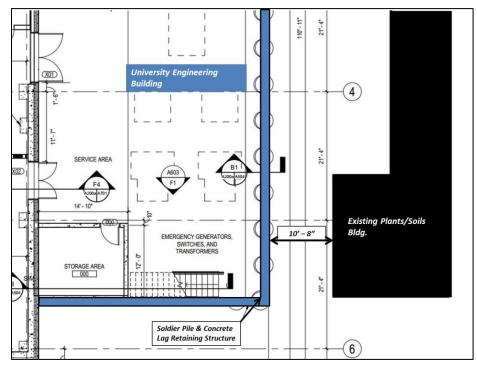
Building Proximity Detail (Courtesy of Stantec)
